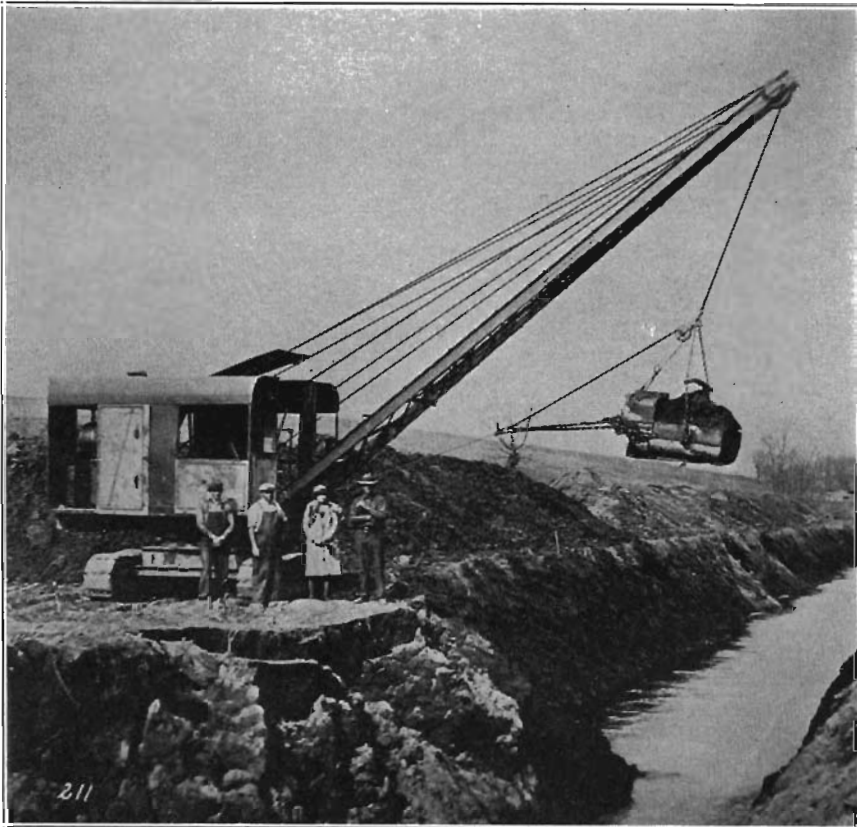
Crane equipped with dragline bucket. Courtesy Speeder Machinery Corporation, Cedar Rapids.
